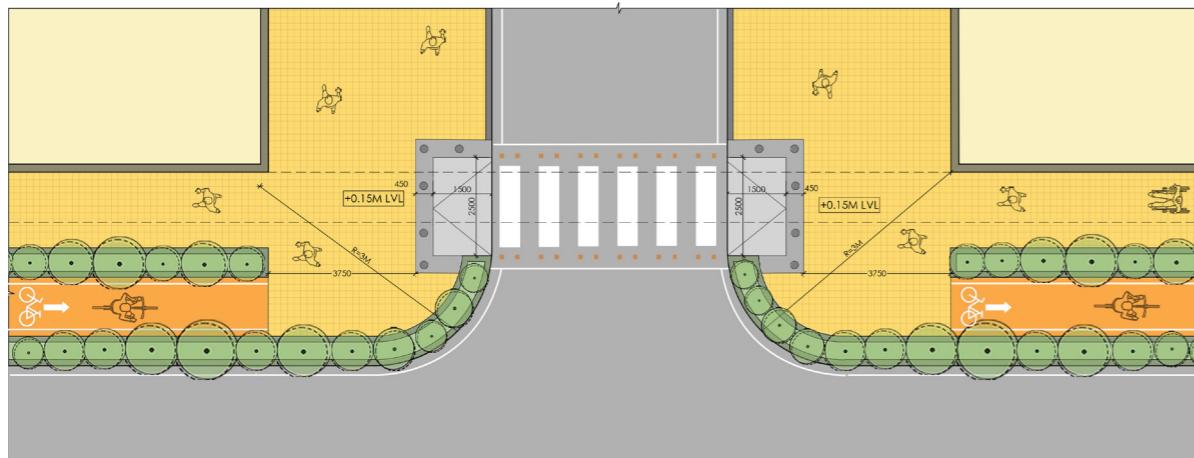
Diagram indicating typical cross road junction with zebra crossing
